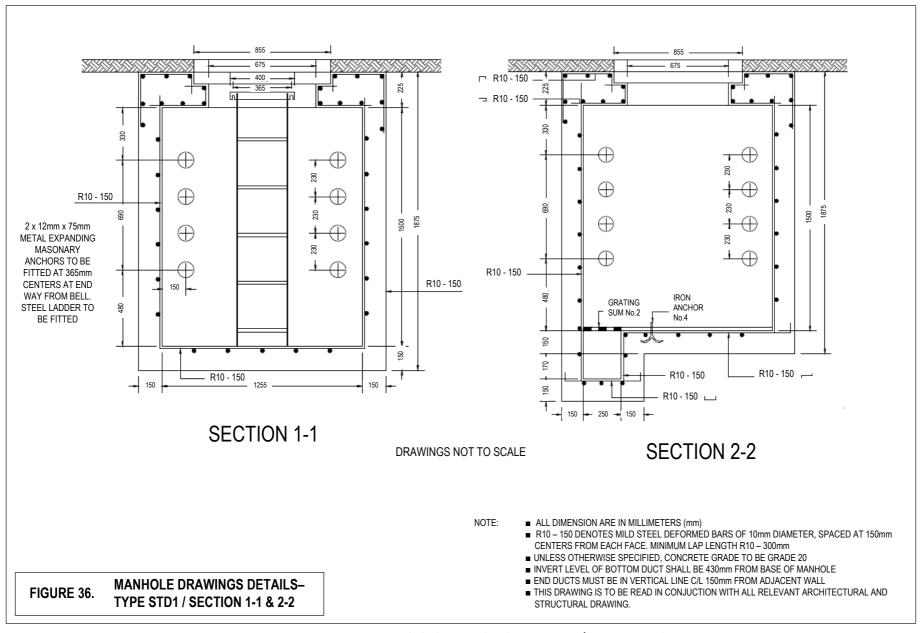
Manhole drawings details – Type STD1 / section 1-1 and 2-2
